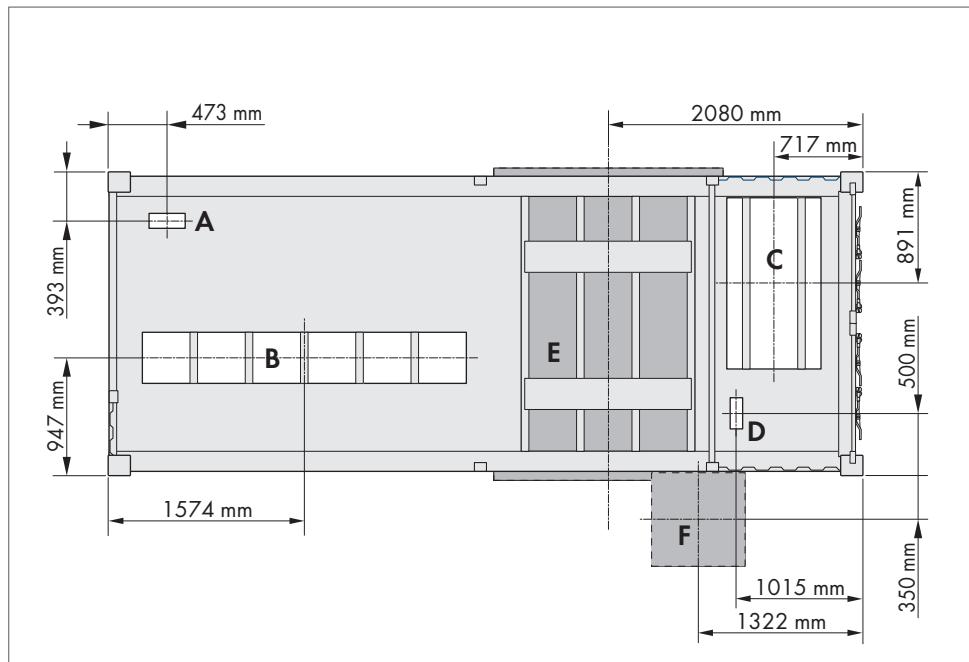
Position and recommended dimensions of recesses with recommended foundation area
